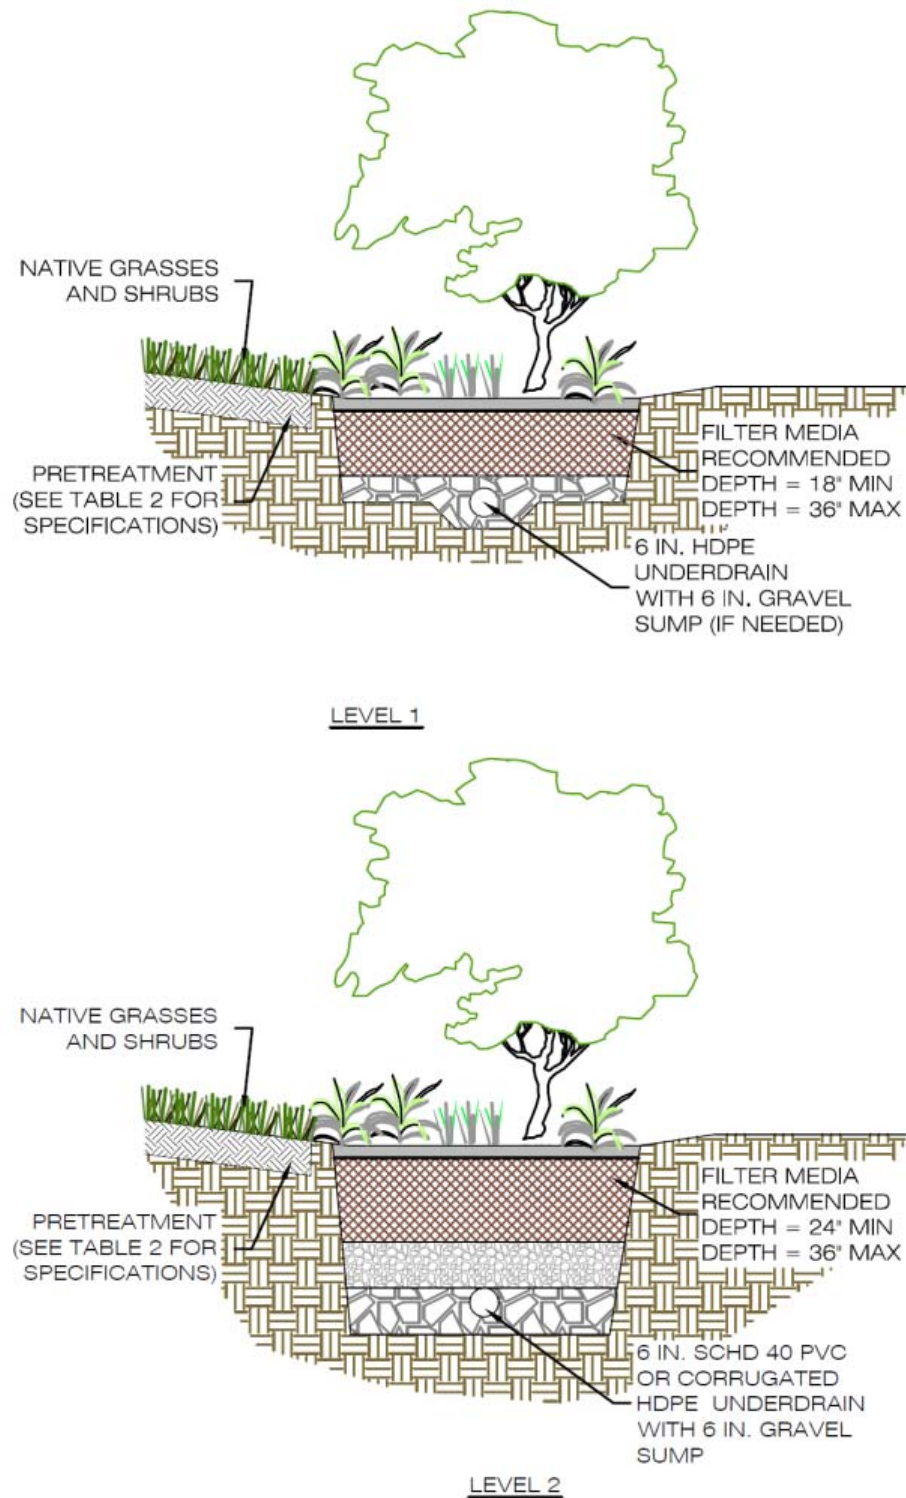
through 9.5 provide some typical details for several bioretention configurations. Also see additional details in Appendix 9-B of this design specification.
